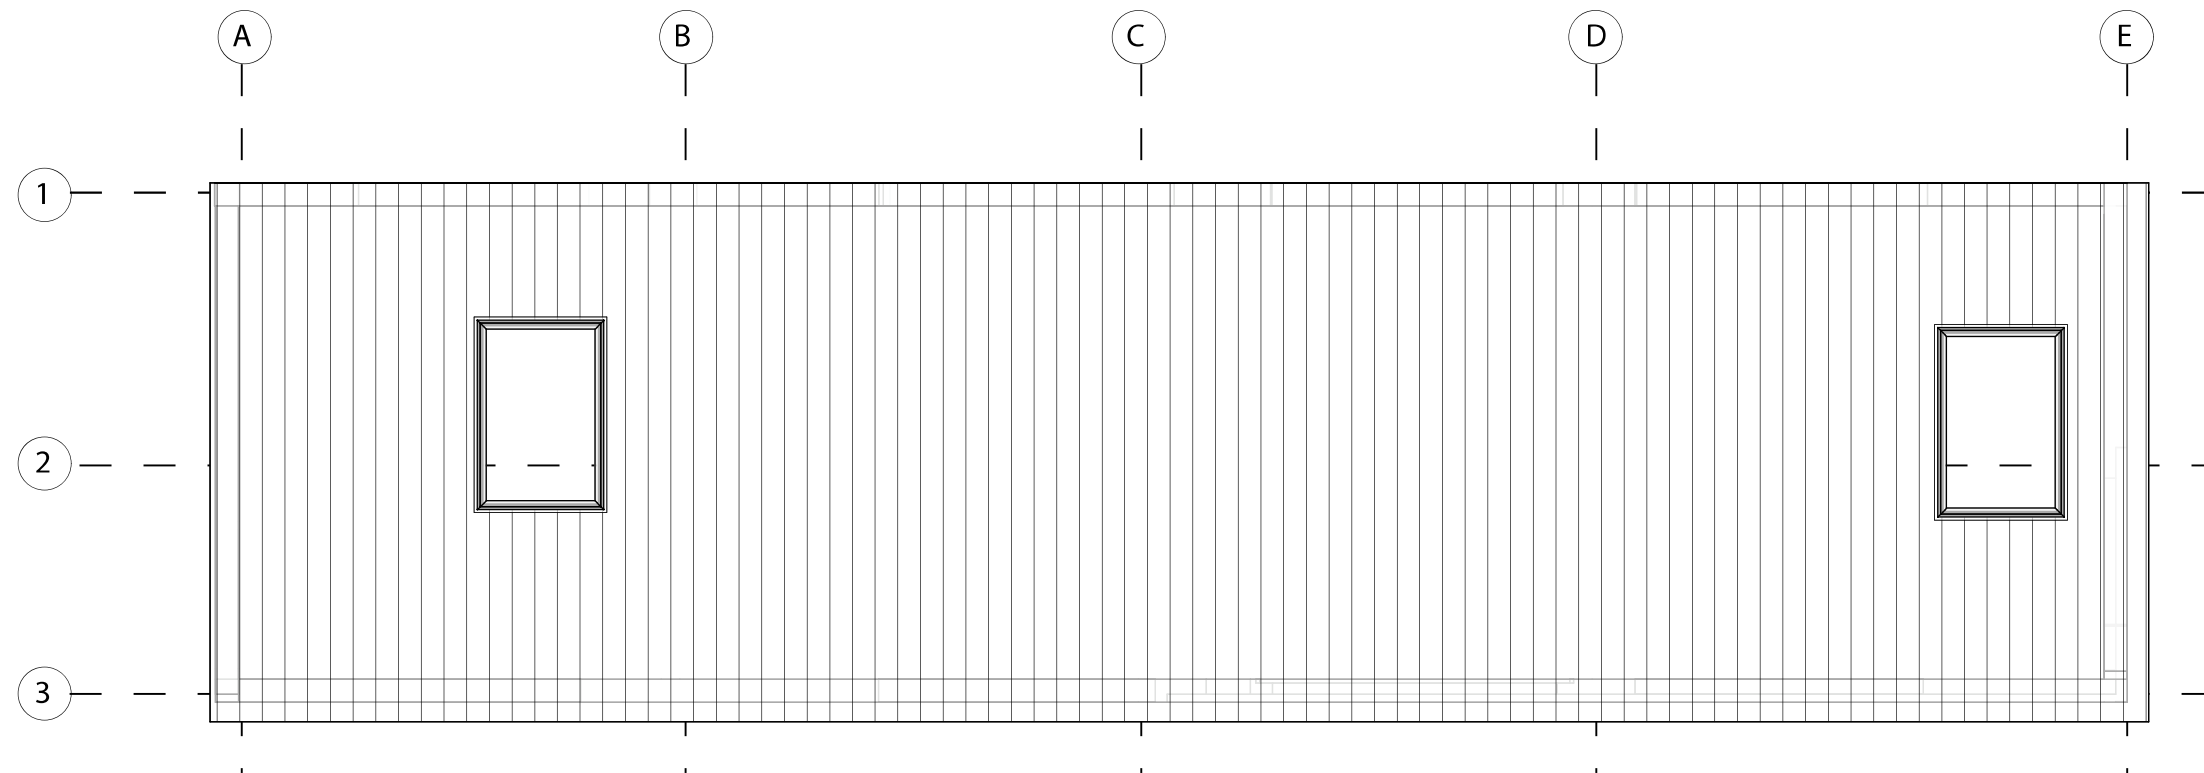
ROOF PLAN: SCALE 1/4" = 1'0"
